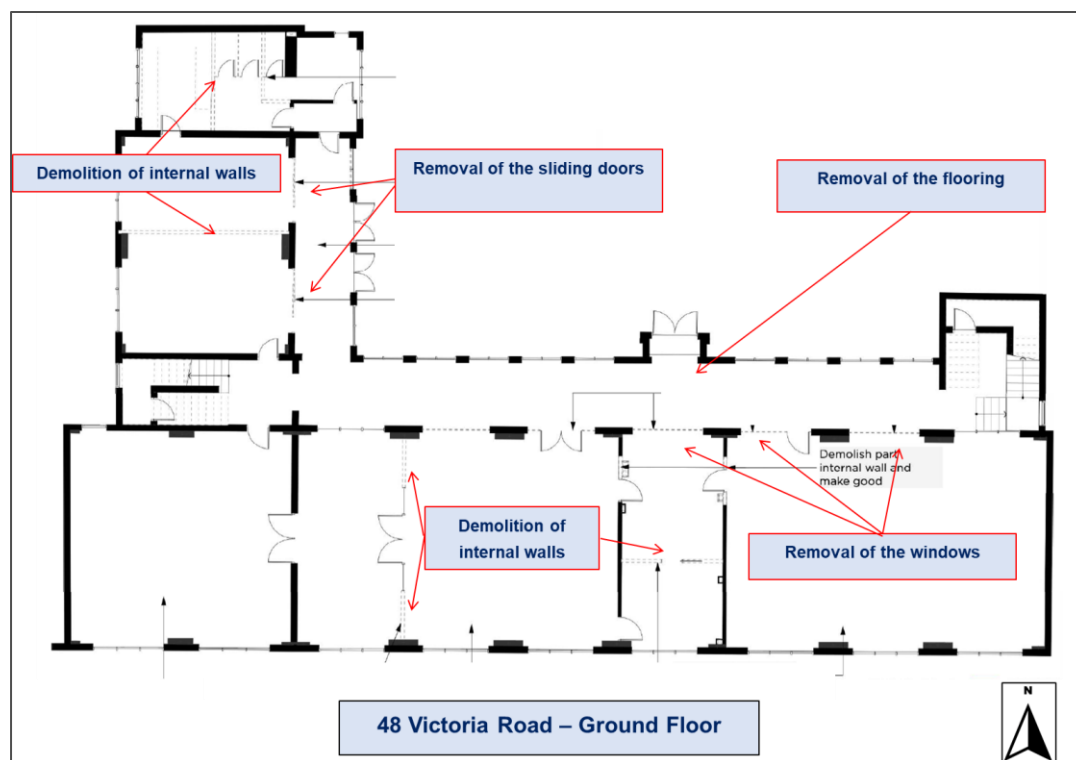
| Proposed demolition works - Victoria Road site (Source: Applicant's RtS 2022)
